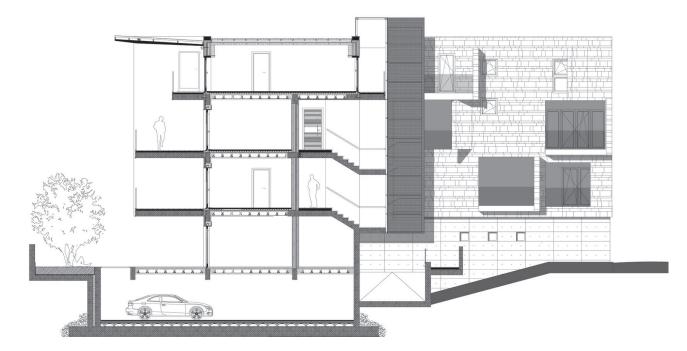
Detail composition of cross-section and elevation, originally drawn at 1:50 scale, of a residential building in Pescara (2009-2012). Detail drawing by the author.
